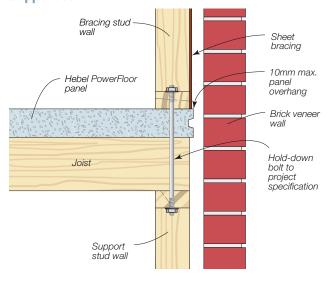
Hold-down of External Bracing Wall Parallel to Joists
